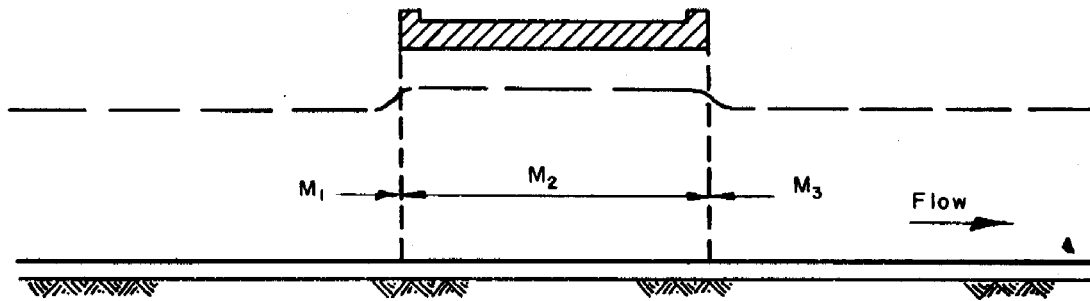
Longitudinal section along centerline of channel indicates three locations: I - immediately upstream, II - Under bridge, III - Immediately downstream.
